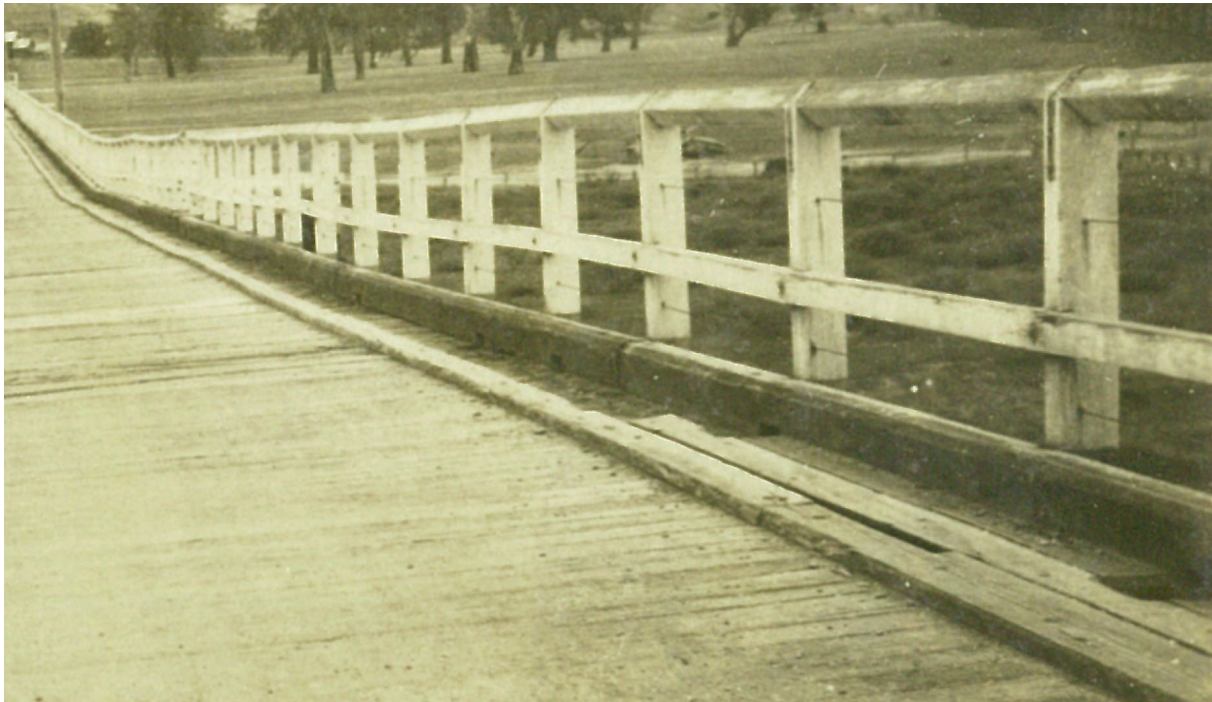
Prince Alfred Bridge Viaduct (1929) – Photograph Showing Timber Rails with Steel Wire
